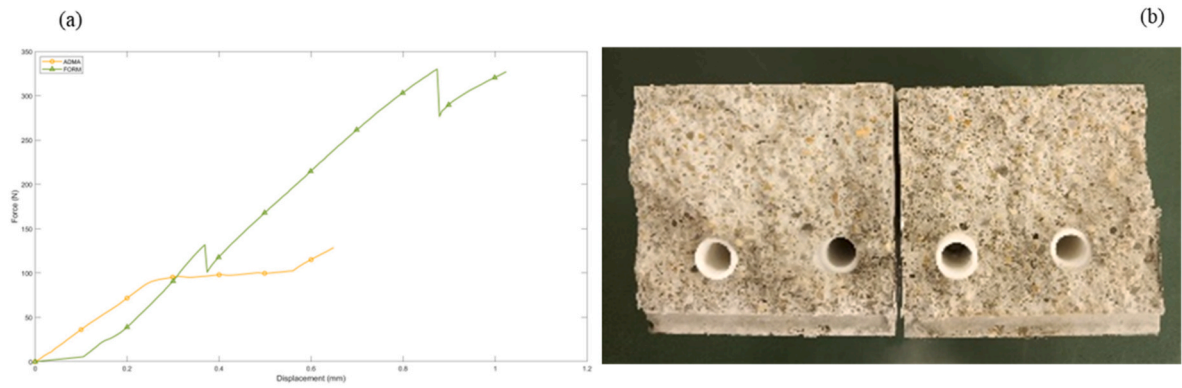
(a) Results of the pull-out tests performed on the 3D printed macrocapsules (b) Opened specimen containing FORM macrocapsules.
